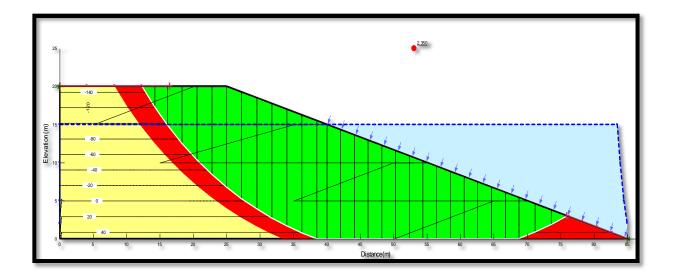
Embankment cross section for 1:3 slope at 15 m water leve
